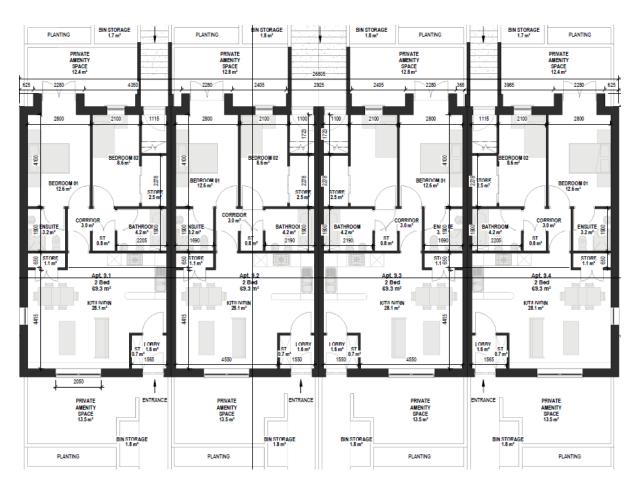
Ground floor level of Apartments & Duplex Apartment Blocks, 4 no. apartments are provided within each of the 2 no. blocks at this level.
